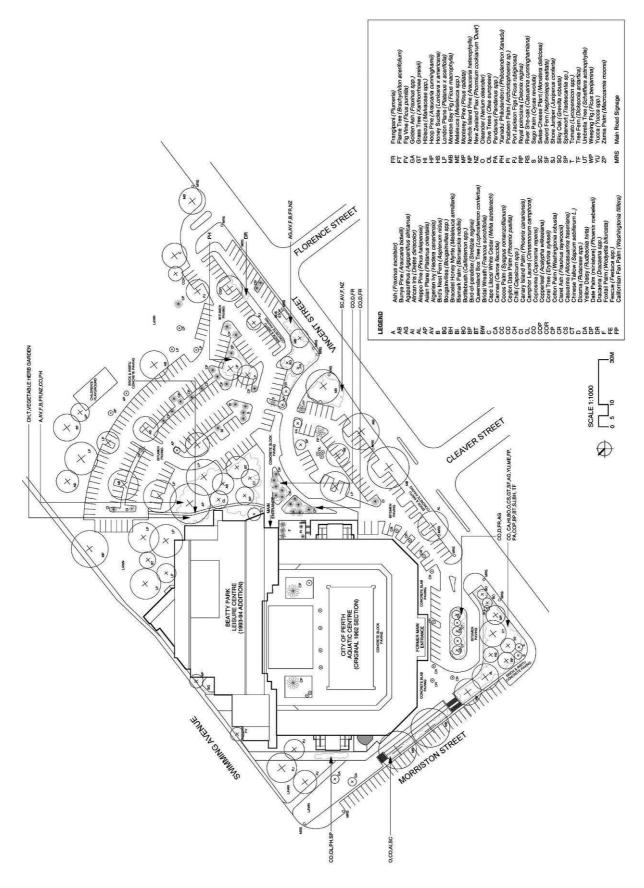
Beatty Park and Beatty Park Leisure Centre - Site Plan.
